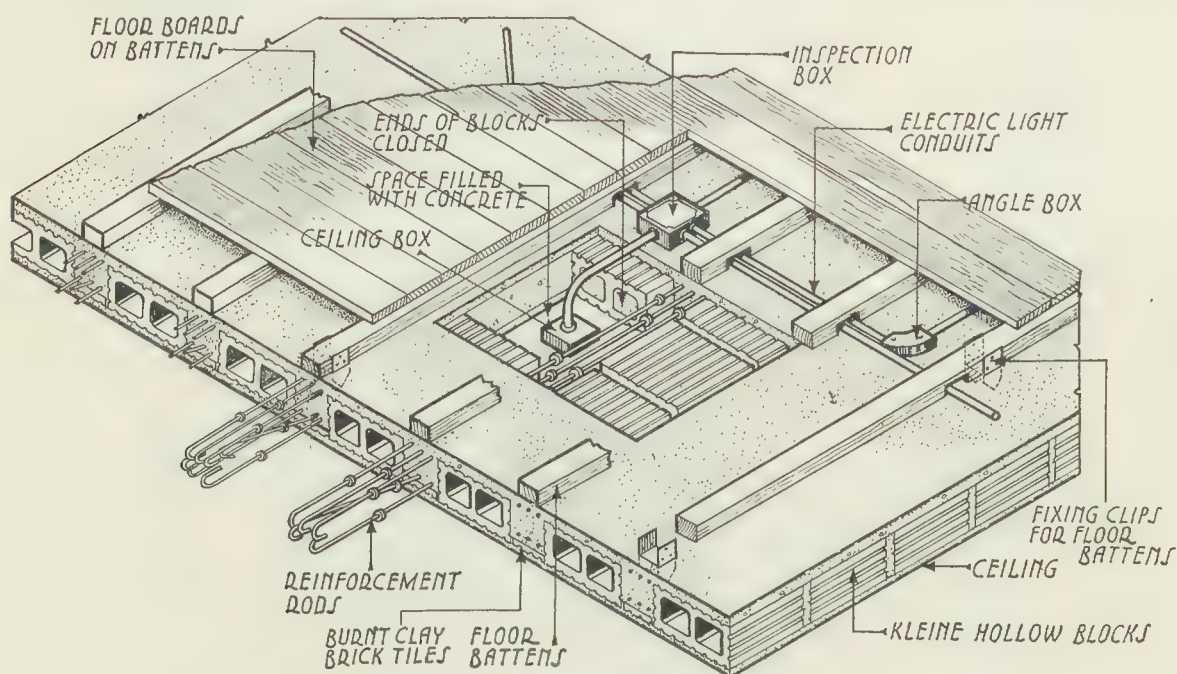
METHOD OF HOUSING SERVICE PIPES UNDER FLOOR FINISHINGS
